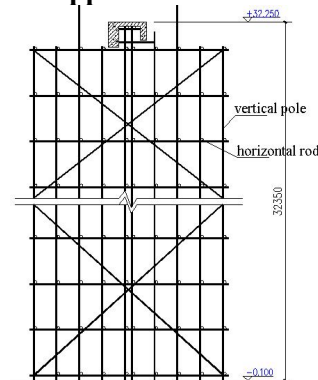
Sectional View of Floor Type High Formwork Support Frame
